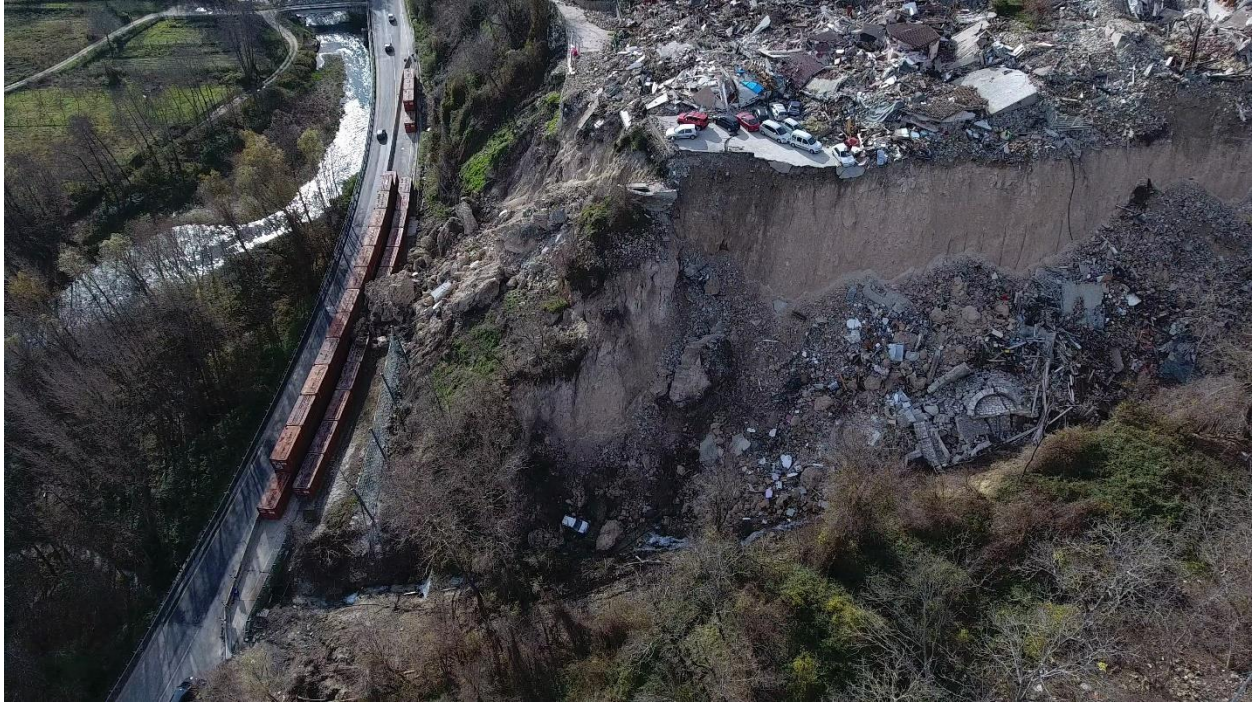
View of talus behind failed retaining wall by Strada Statale No. 4 (Location 3b).
